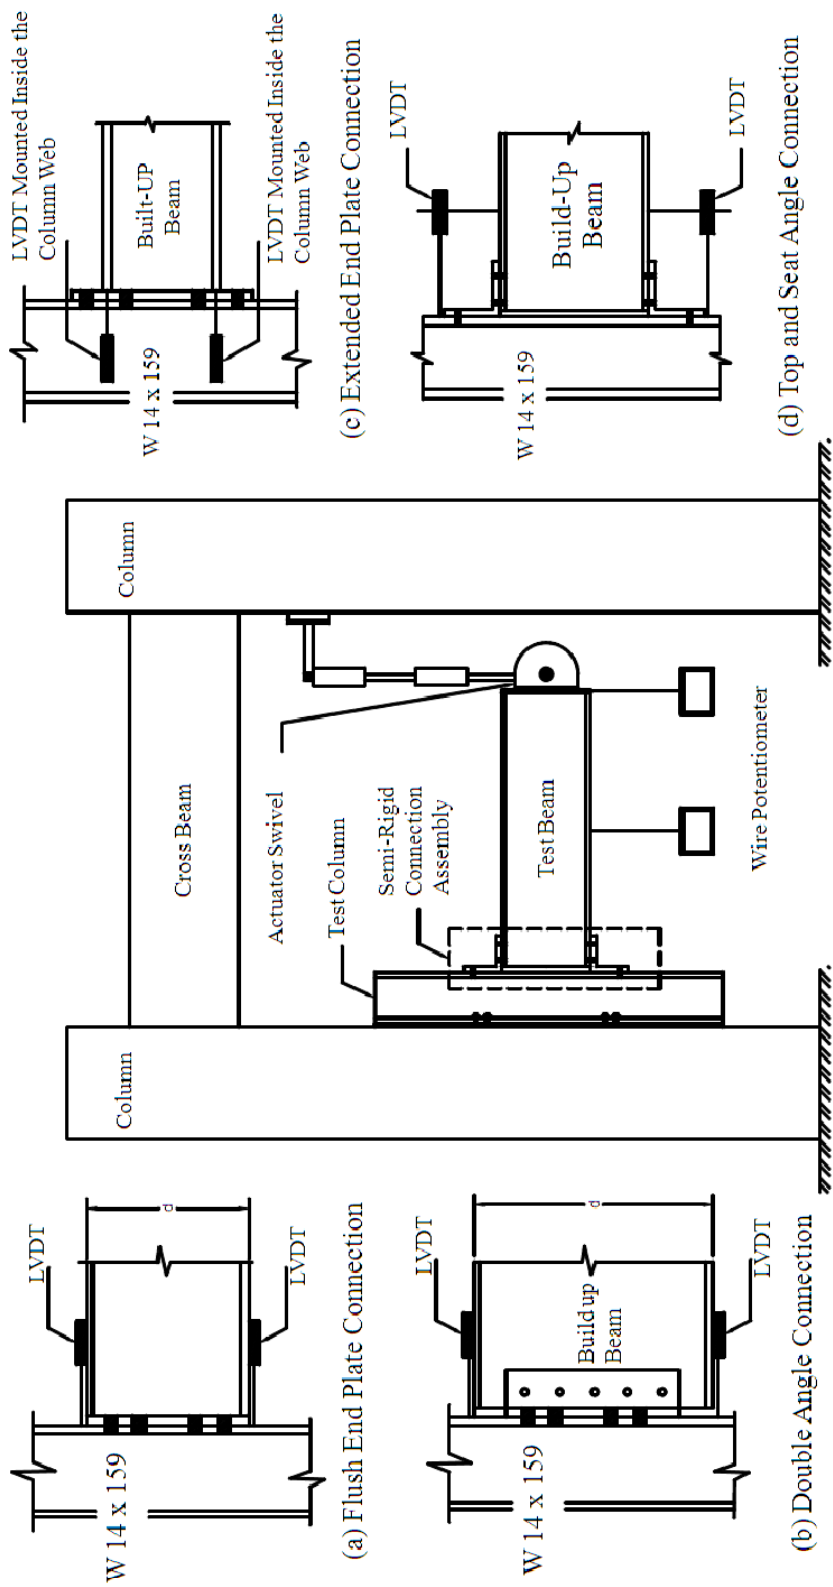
Typical Configuration of The Beam Column Connection Test Setup
